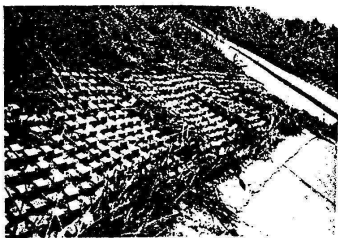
Bank repairs near Morrow Street, Brunswick
